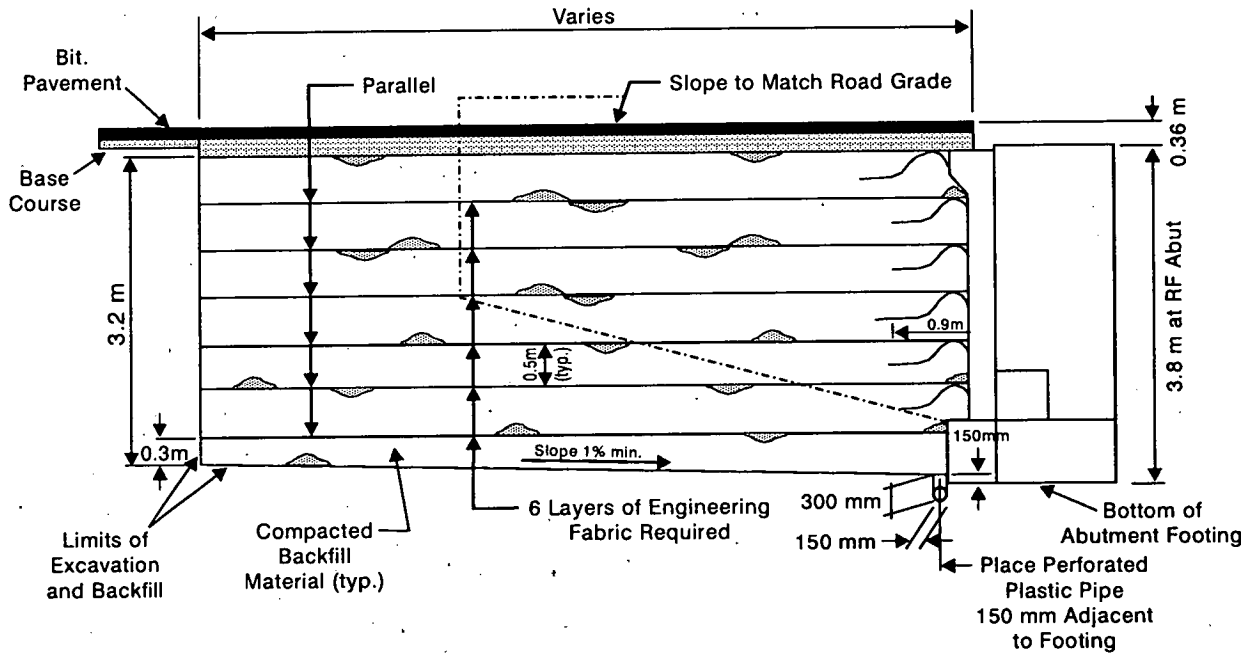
Fabric reinforced soil wall as used by Wyoming DOT (after 64).
